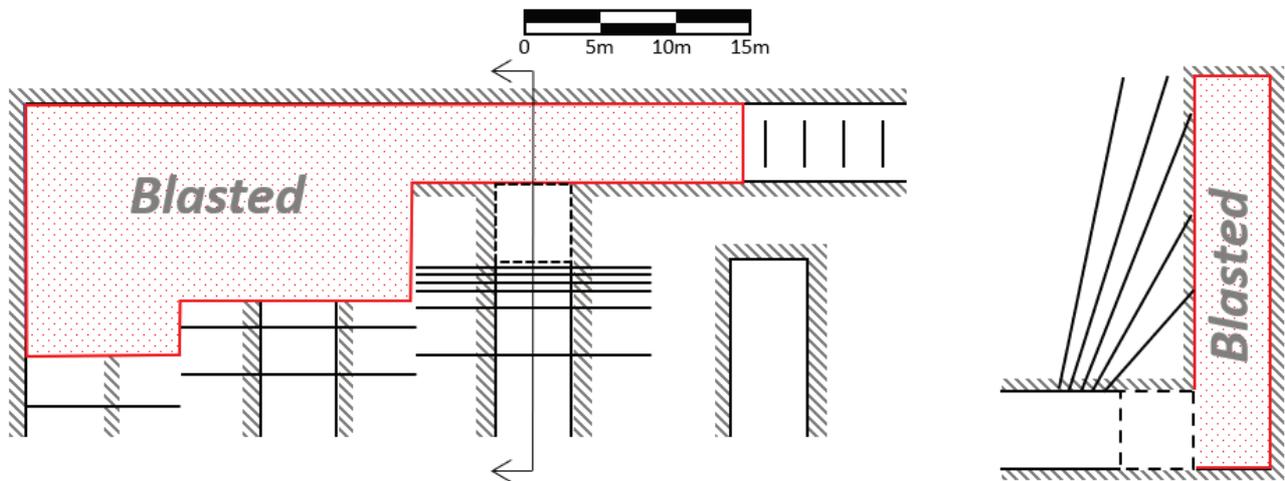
Layout of slot drift, post-breakthrough plan view and section view
